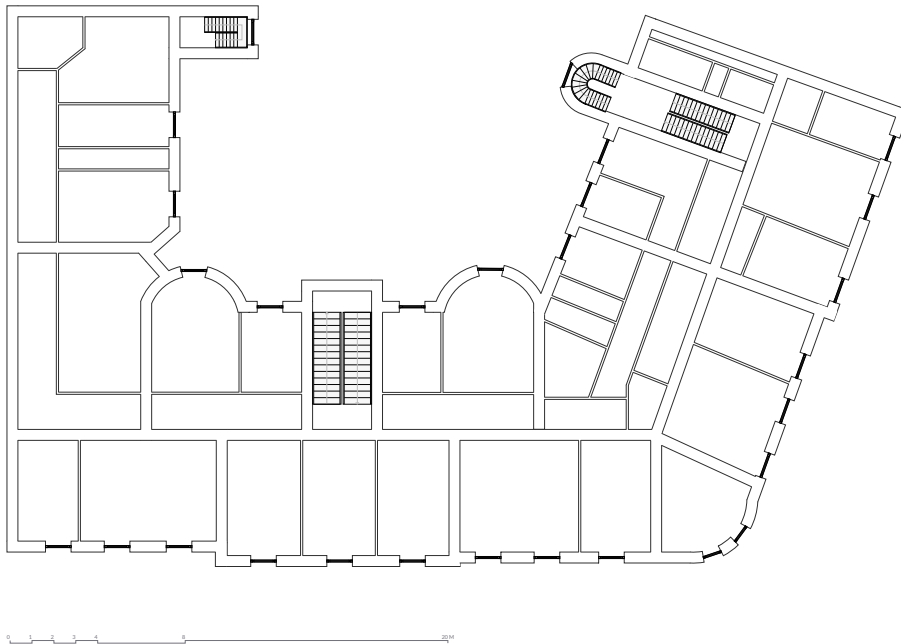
Alberta street 13 floor plan. Created by Eliza, 2025.
